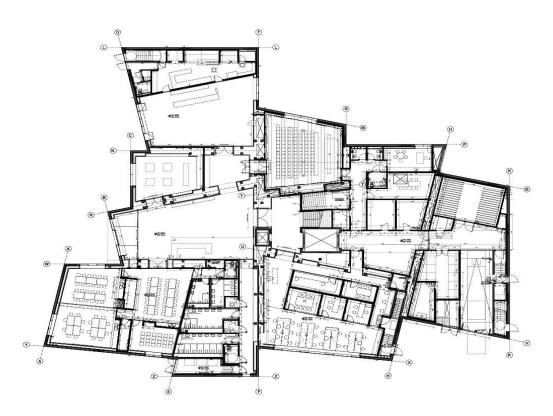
Ground Floor Plan of The Hepworth Gallery
